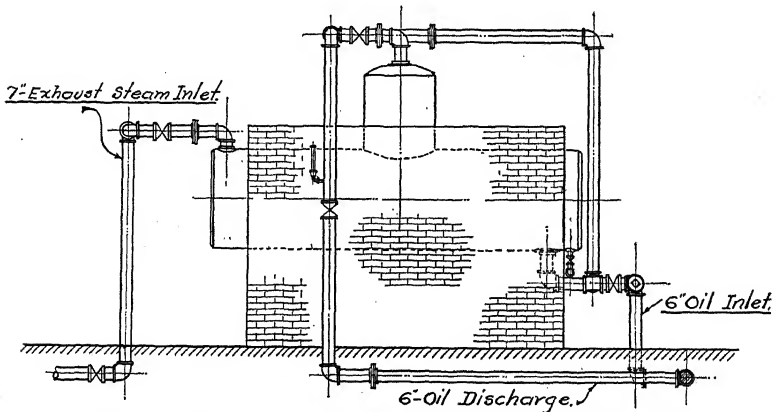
FIRST OIL-HEATING PLANT. SIDE ELEVATION.
